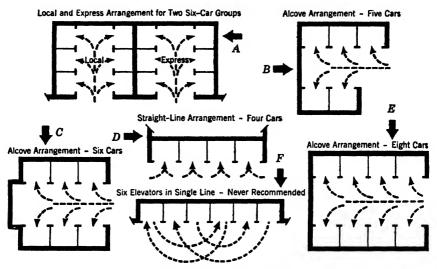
The free flow of traffic into and out of elevators at the lower lobby is facilitated by the arrangements A, B, C, D, and E. Arrangement F is never used since cross traffic hinders entrance and exit of passengers.
